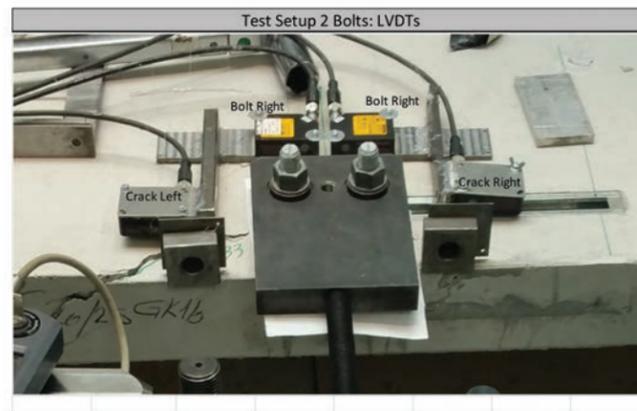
Test Setup 2 Bolts: LVDTs.
